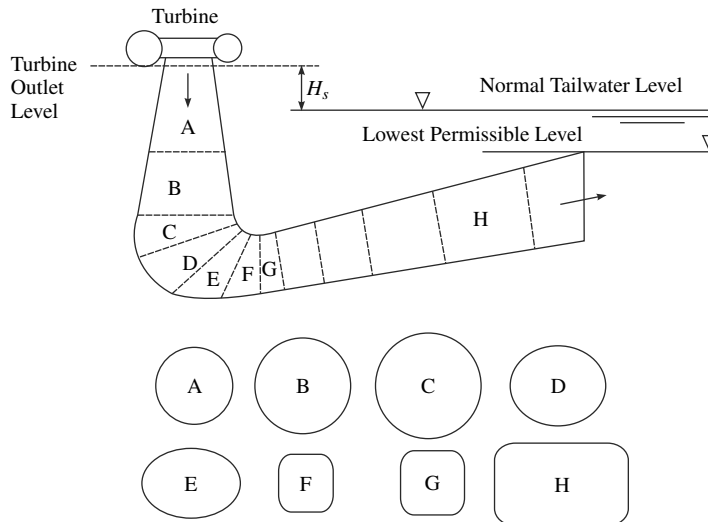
A well-designed elbow-type draft tube of varying cross section
